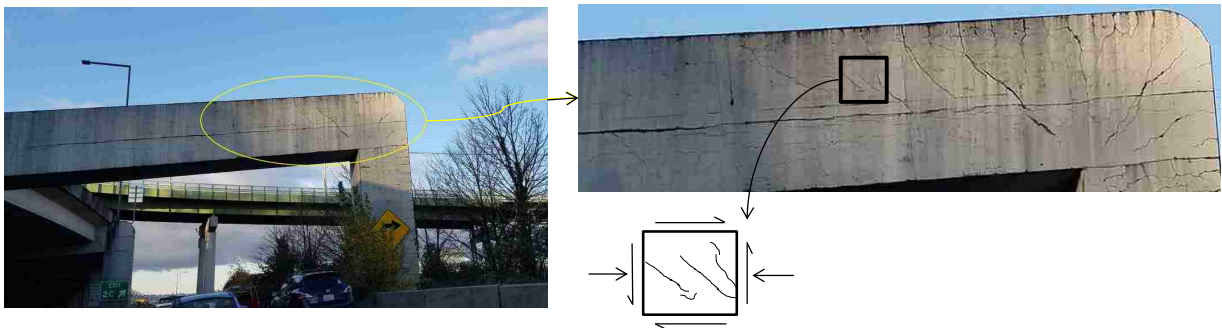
(a) Typical cracked bridge girder. (b) Developed structural cracks in the girder
